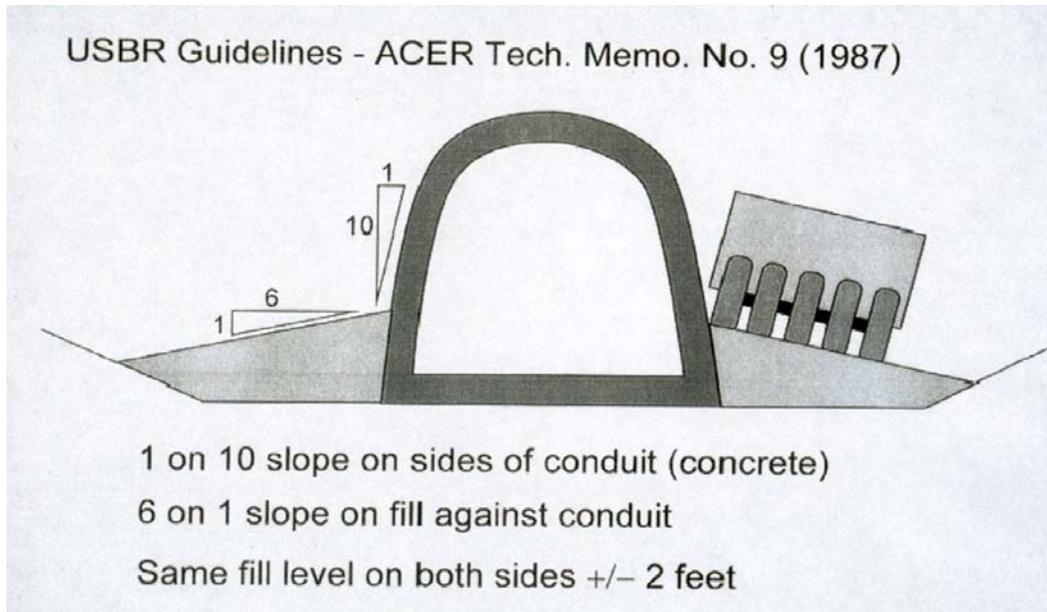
Recommended fill placement and compaction adjacent of a conduit.
